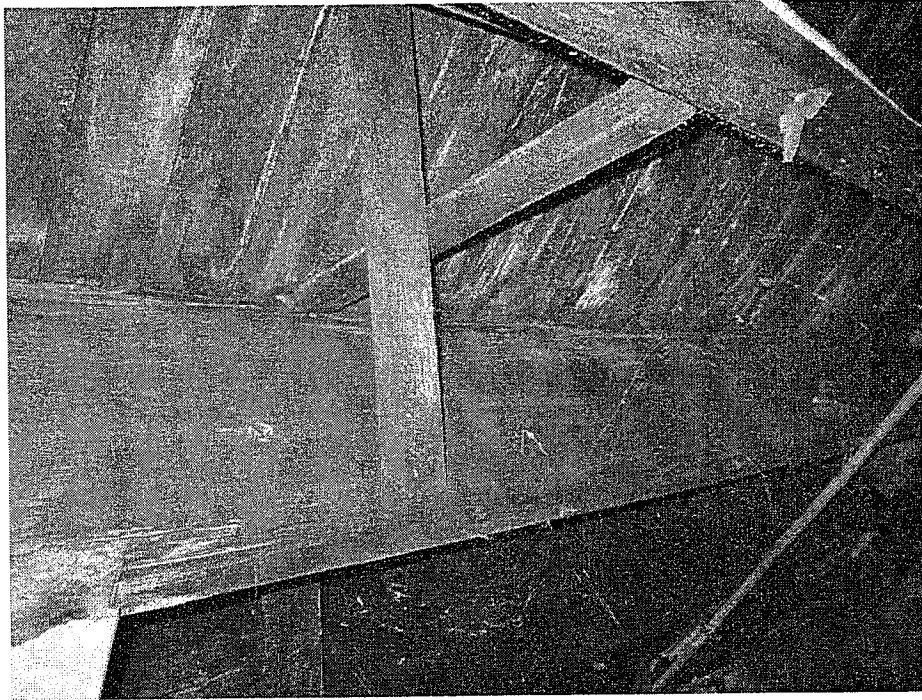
Second floor sagging and deterioration of wood floor joists.
